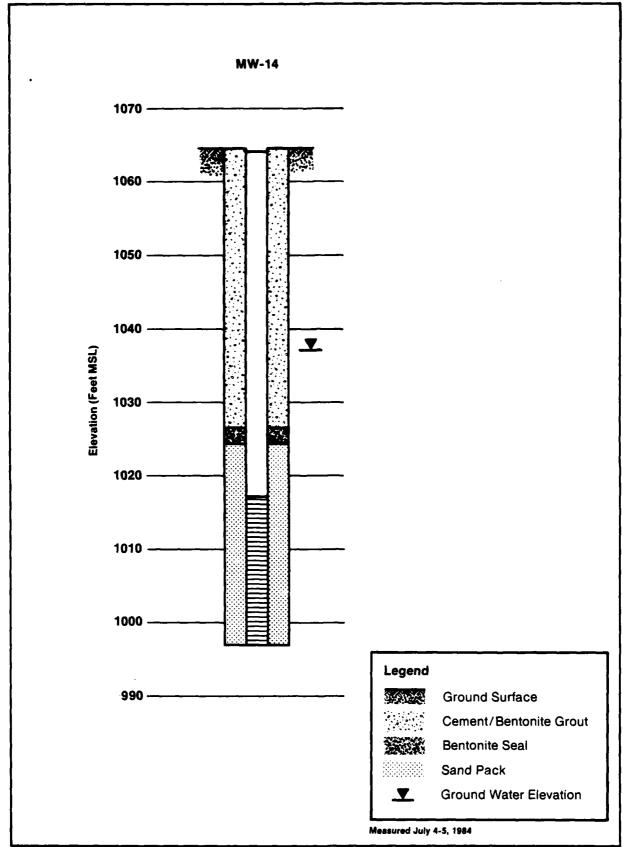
WELL CONSTRUCTION SUMMARY, ZONE 5, MW -14
